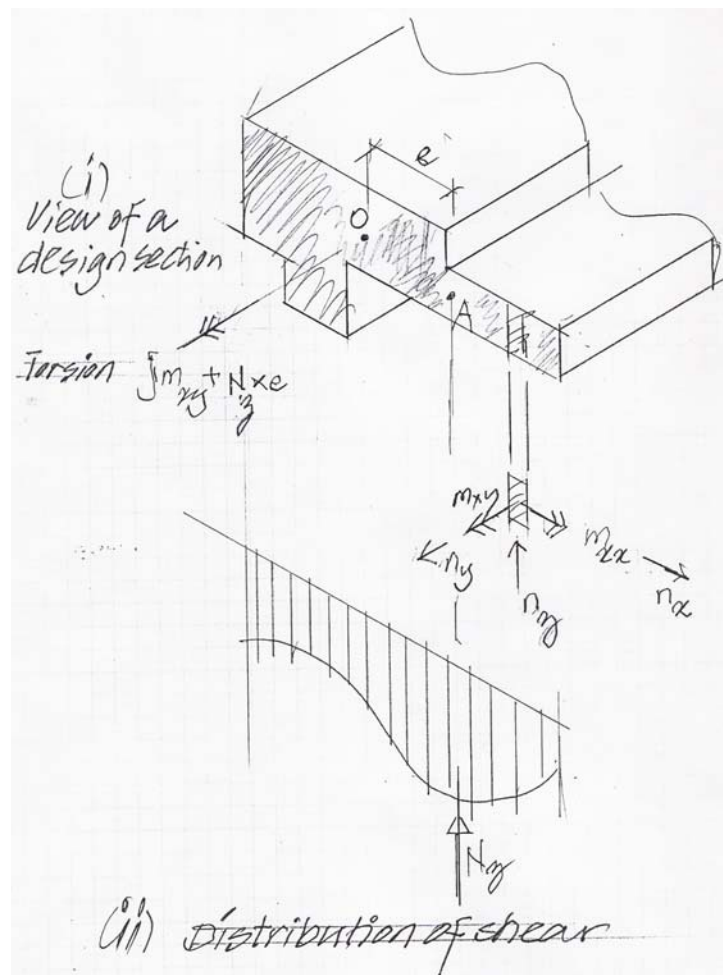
VIEW OF A DESIGN SECTION AND SHEAR
